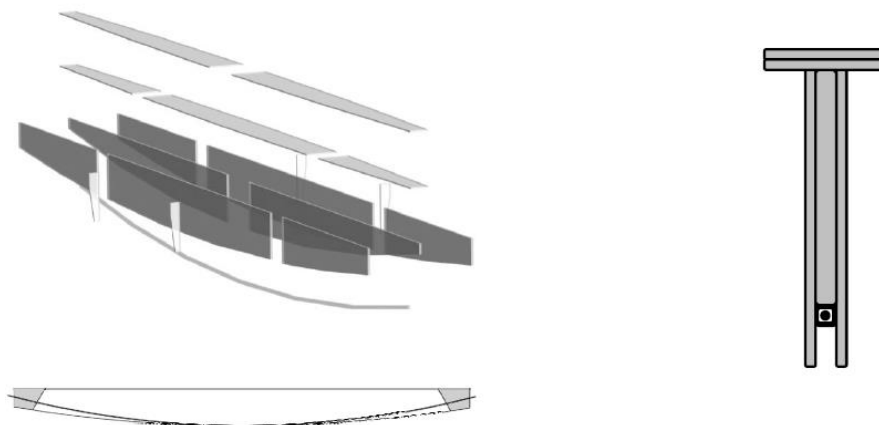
T-section beam layout [left] and cross section [right] (Louter, 2008)
